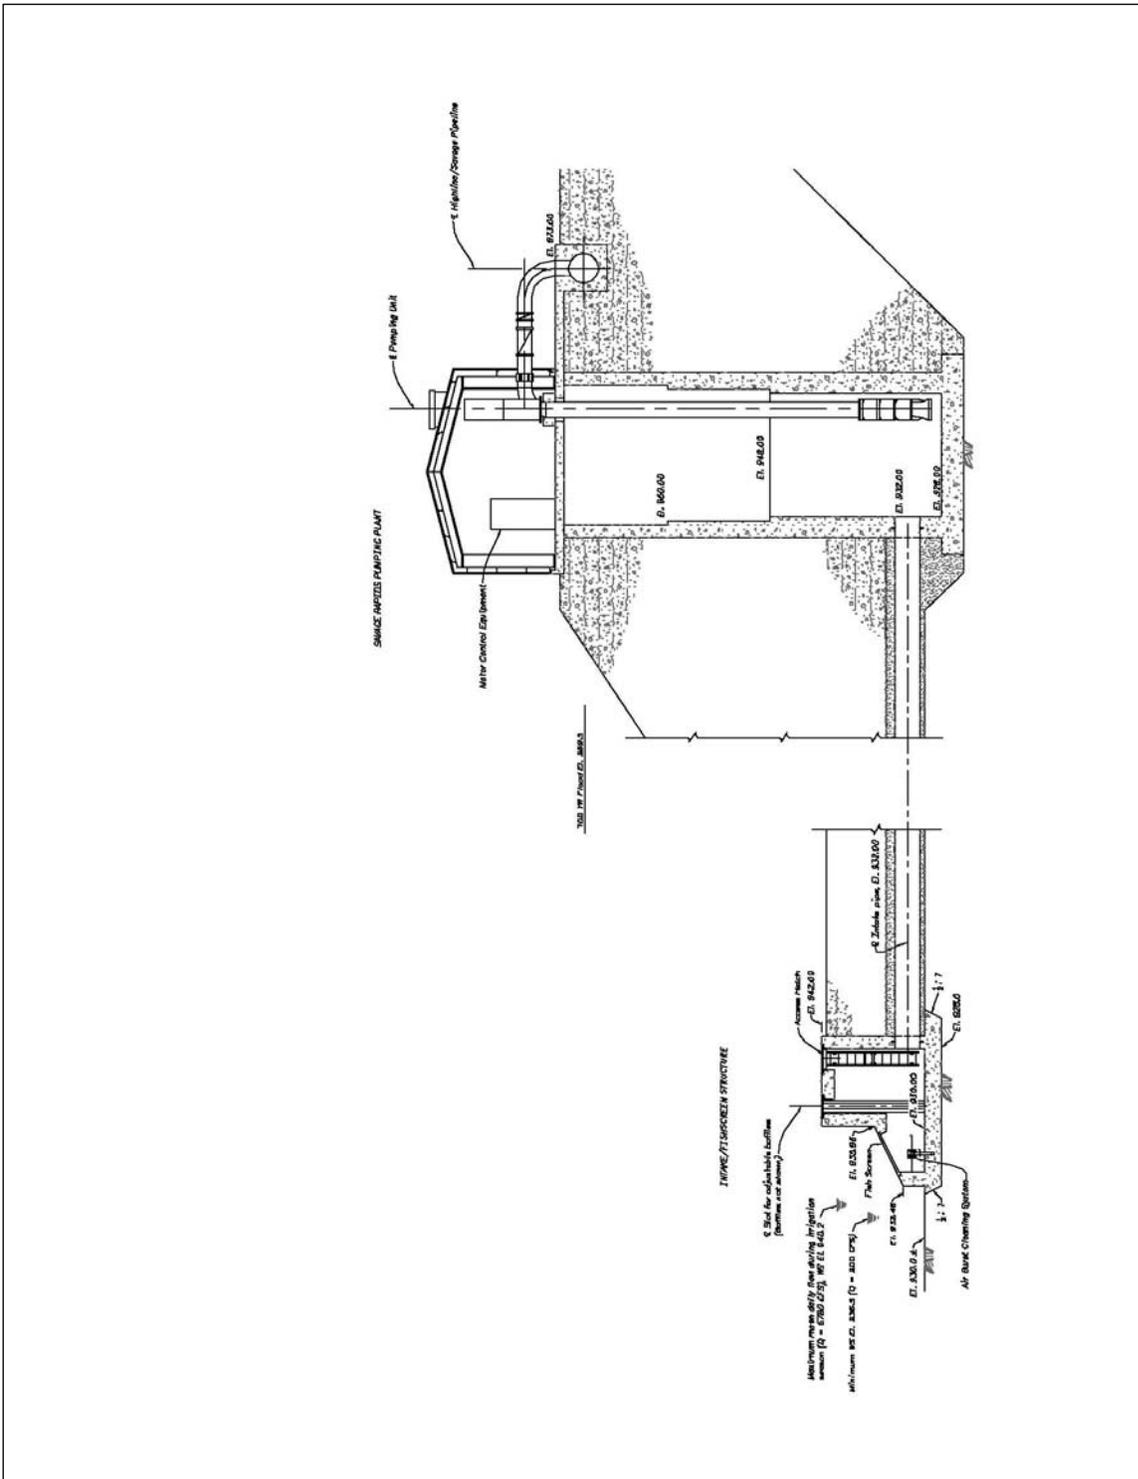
Cross section through pumping plant & intake structure of 2005 Preferred Alternative
